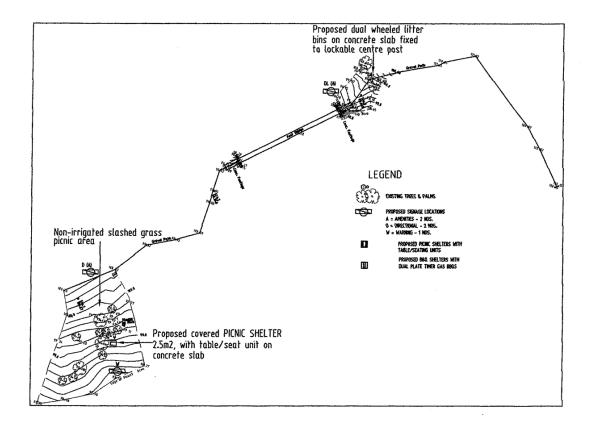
PLAN OF THE SOUTH WALKING TRAIL PICNIC AREA
